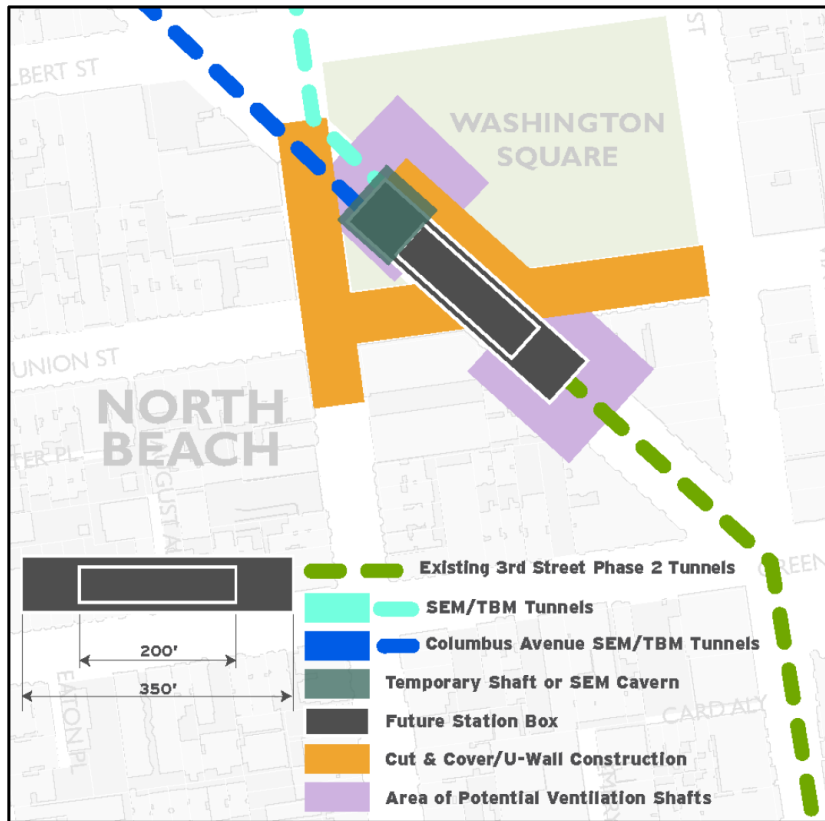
Potential North Beach Station location beneath Columbus Avenue\
